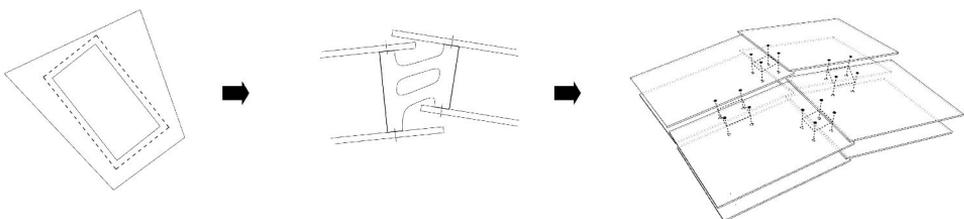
Schematic drawing of the space-shingle connector and loose fit plates.
